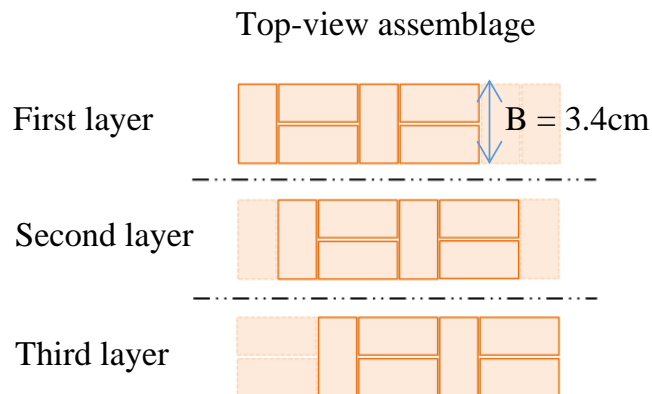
Assemblage used to build the brick walls. A mix of headers and stretchers is used.
